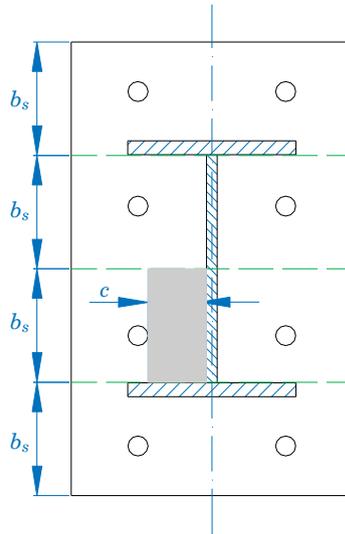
Width of interaction of plate b_s per one bolt and distance c from the edge of the hole to the outer edge of the weld
